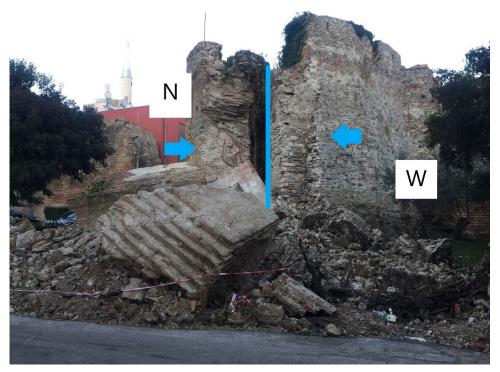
View of the north (N) and west façade (W) of the damaged tower at Durrës Castle (photo: EEFIT).
